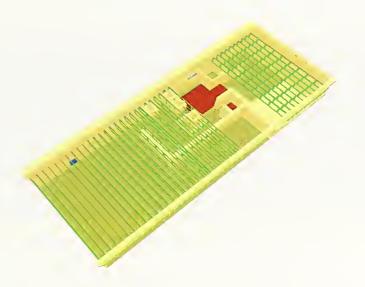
View from the top with the roof and ceiling removed to show trusses and interior walls. Some of the trusses have been removed.
